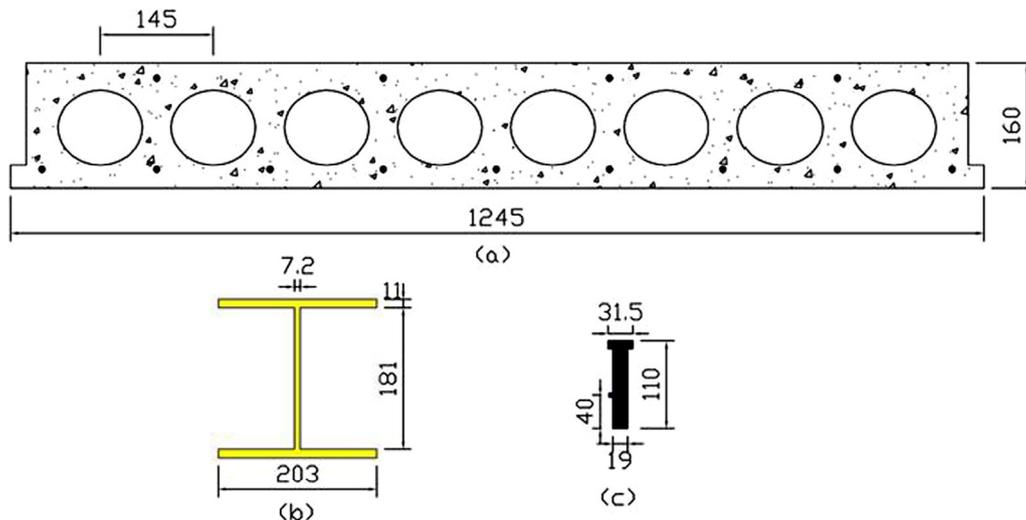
Dimensions of the components of the push-out specimens (unit: millimetres).
